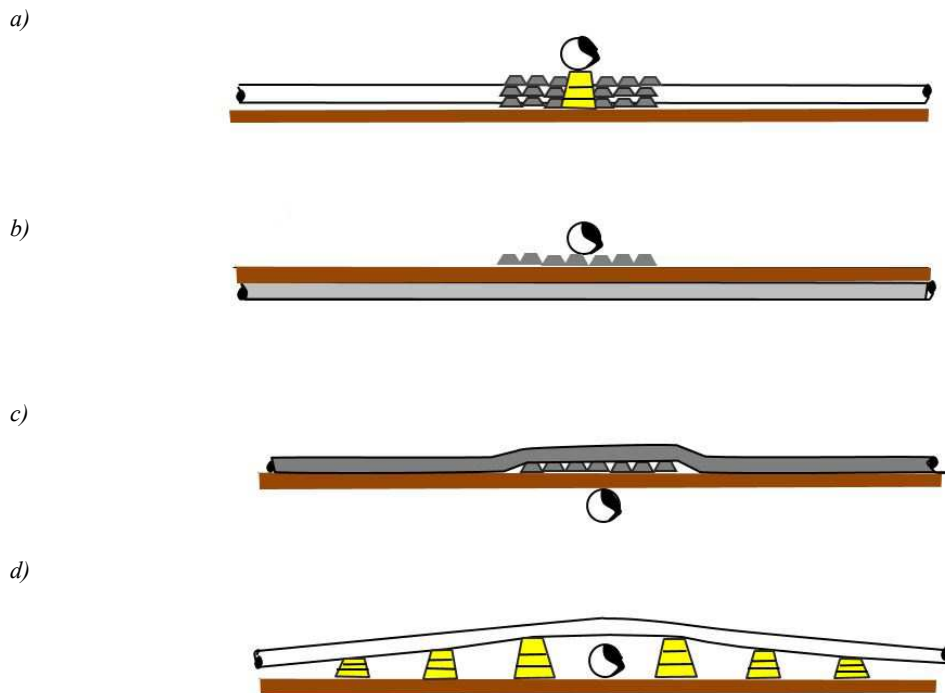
Examples of subsea pipeline crossing configurations [1]:
